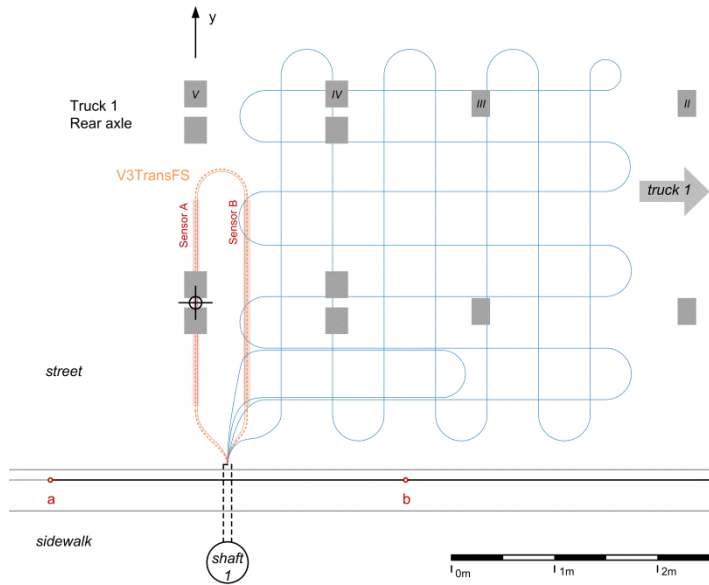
Footprint of truck 1 in tests using the rear axle with sensor V3TransFS
